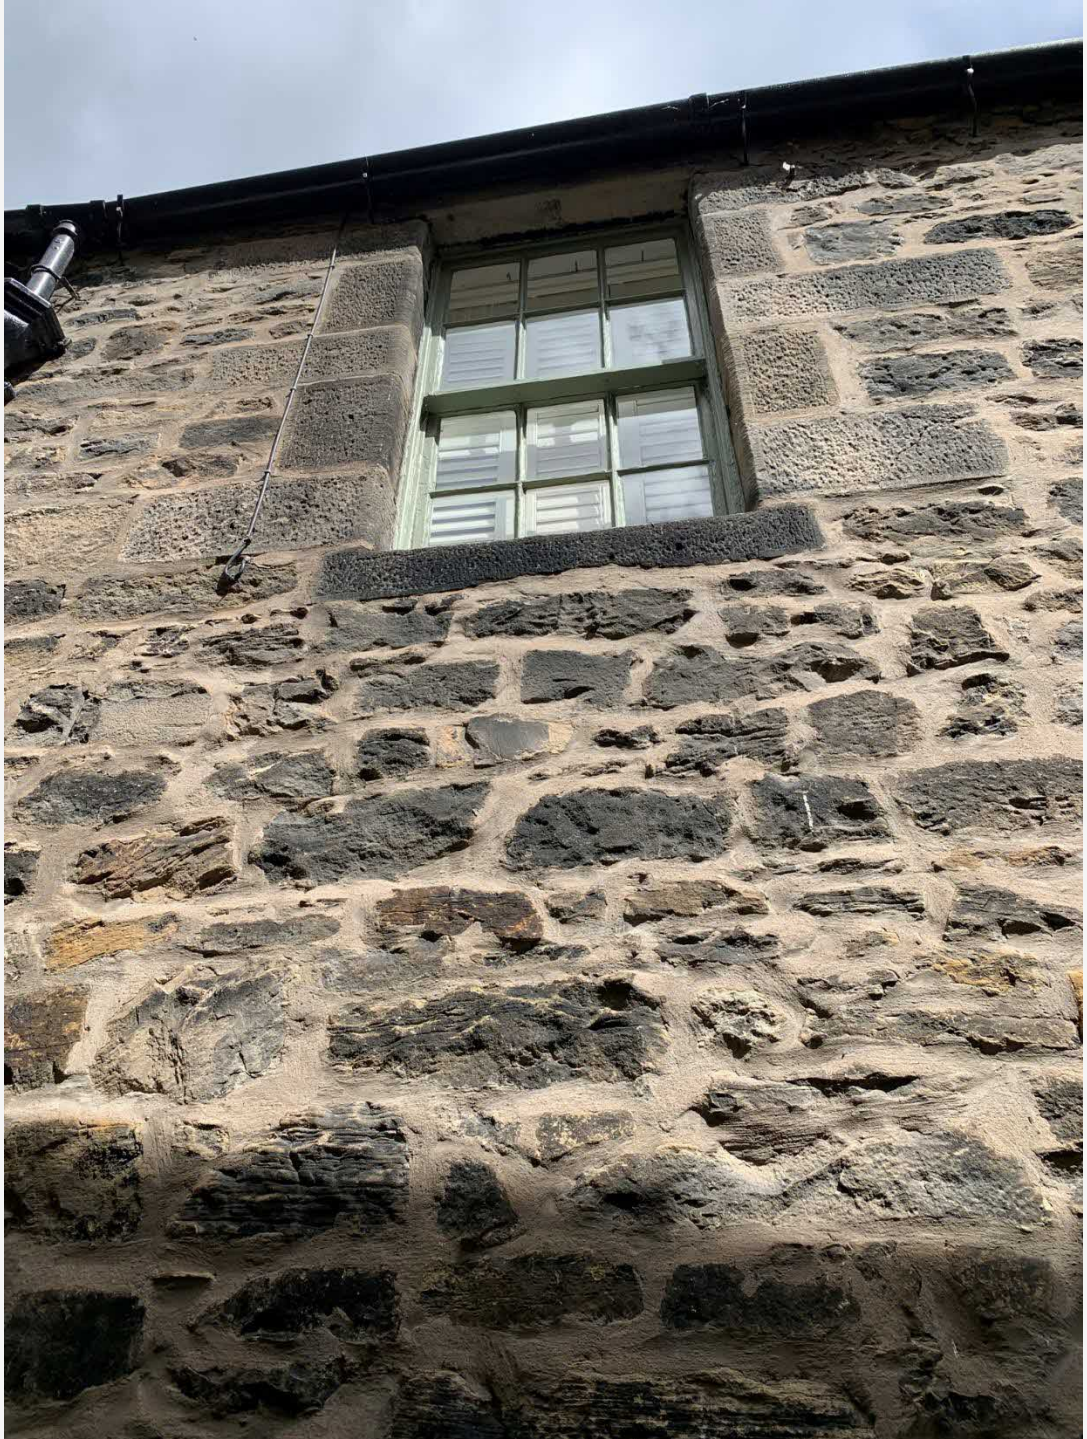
showing the 2no. windows to the rear (south) elevation.
